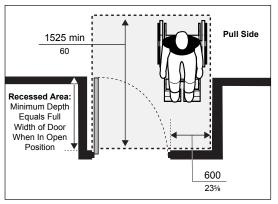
Pull Side Approach at Recessed Swing Door - Plan View
